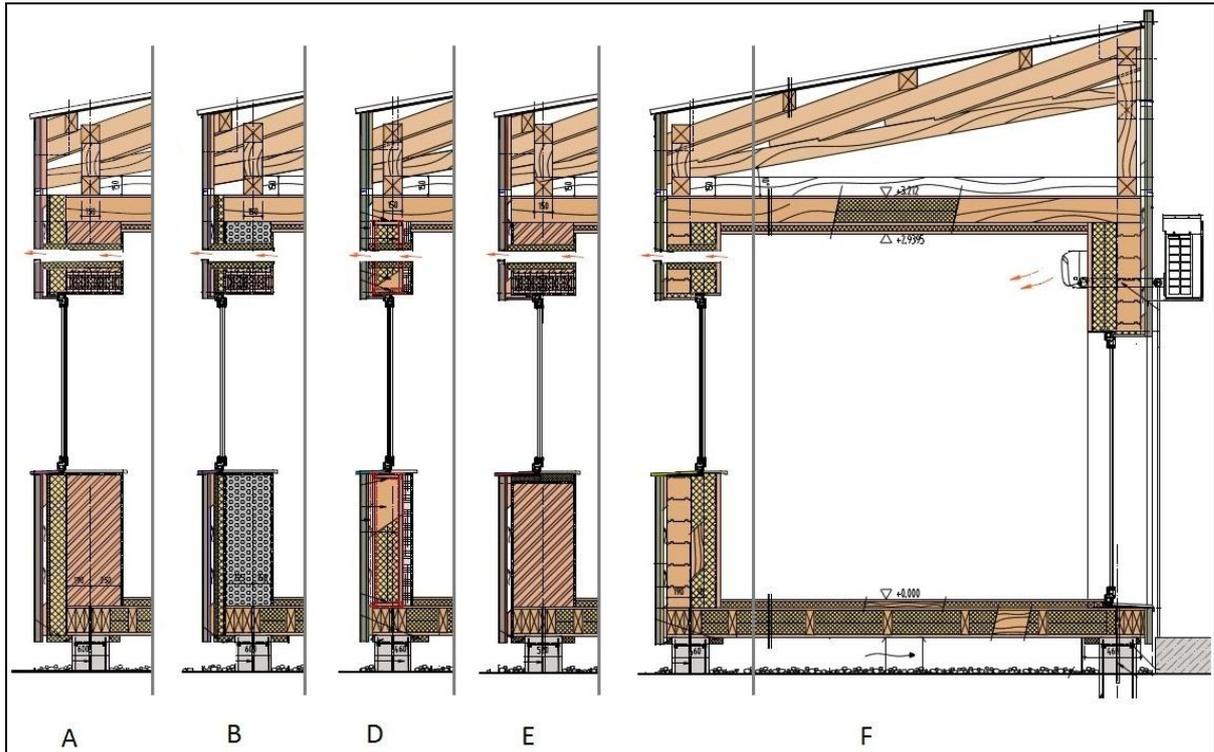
The experimental construction design and engineering solutions in cross section (type A, B, D, E, F)
